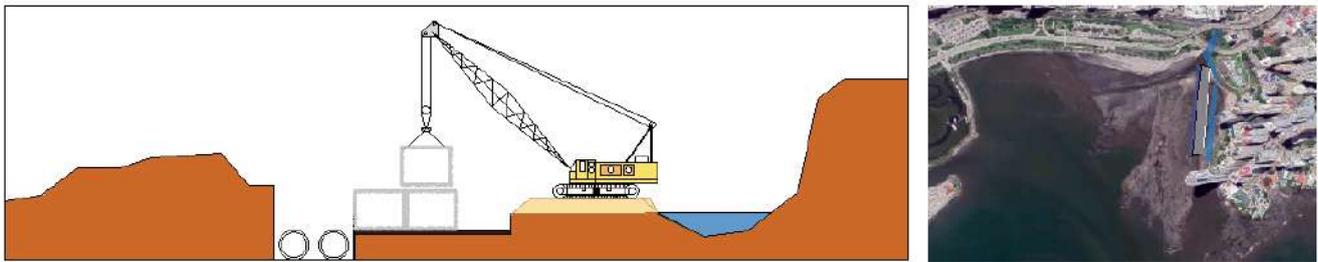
Phase 4: Placement of outfall & culvert sections
